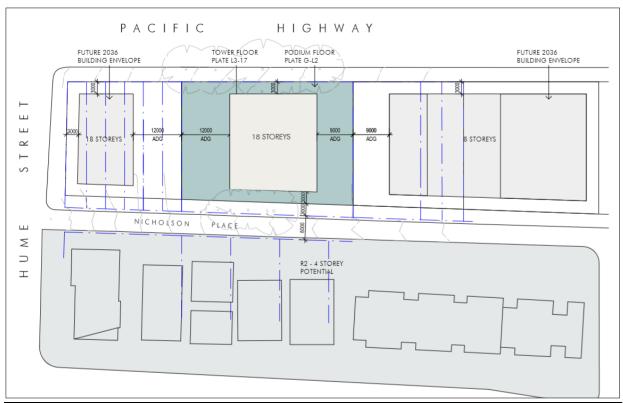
setbacks to proposed tower (source: Nettleton Tribe)
